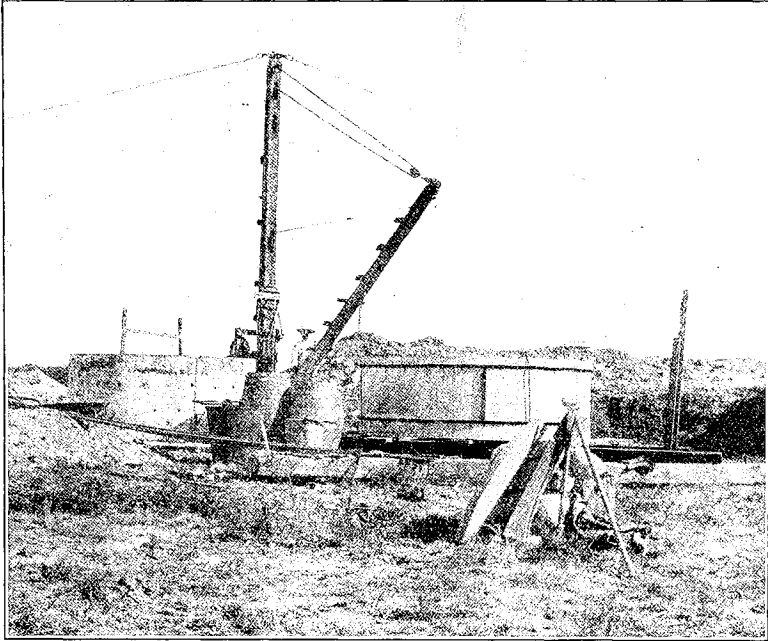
Inside and Outside Forms for Reinforced Concrete Caisson Well Curb.
